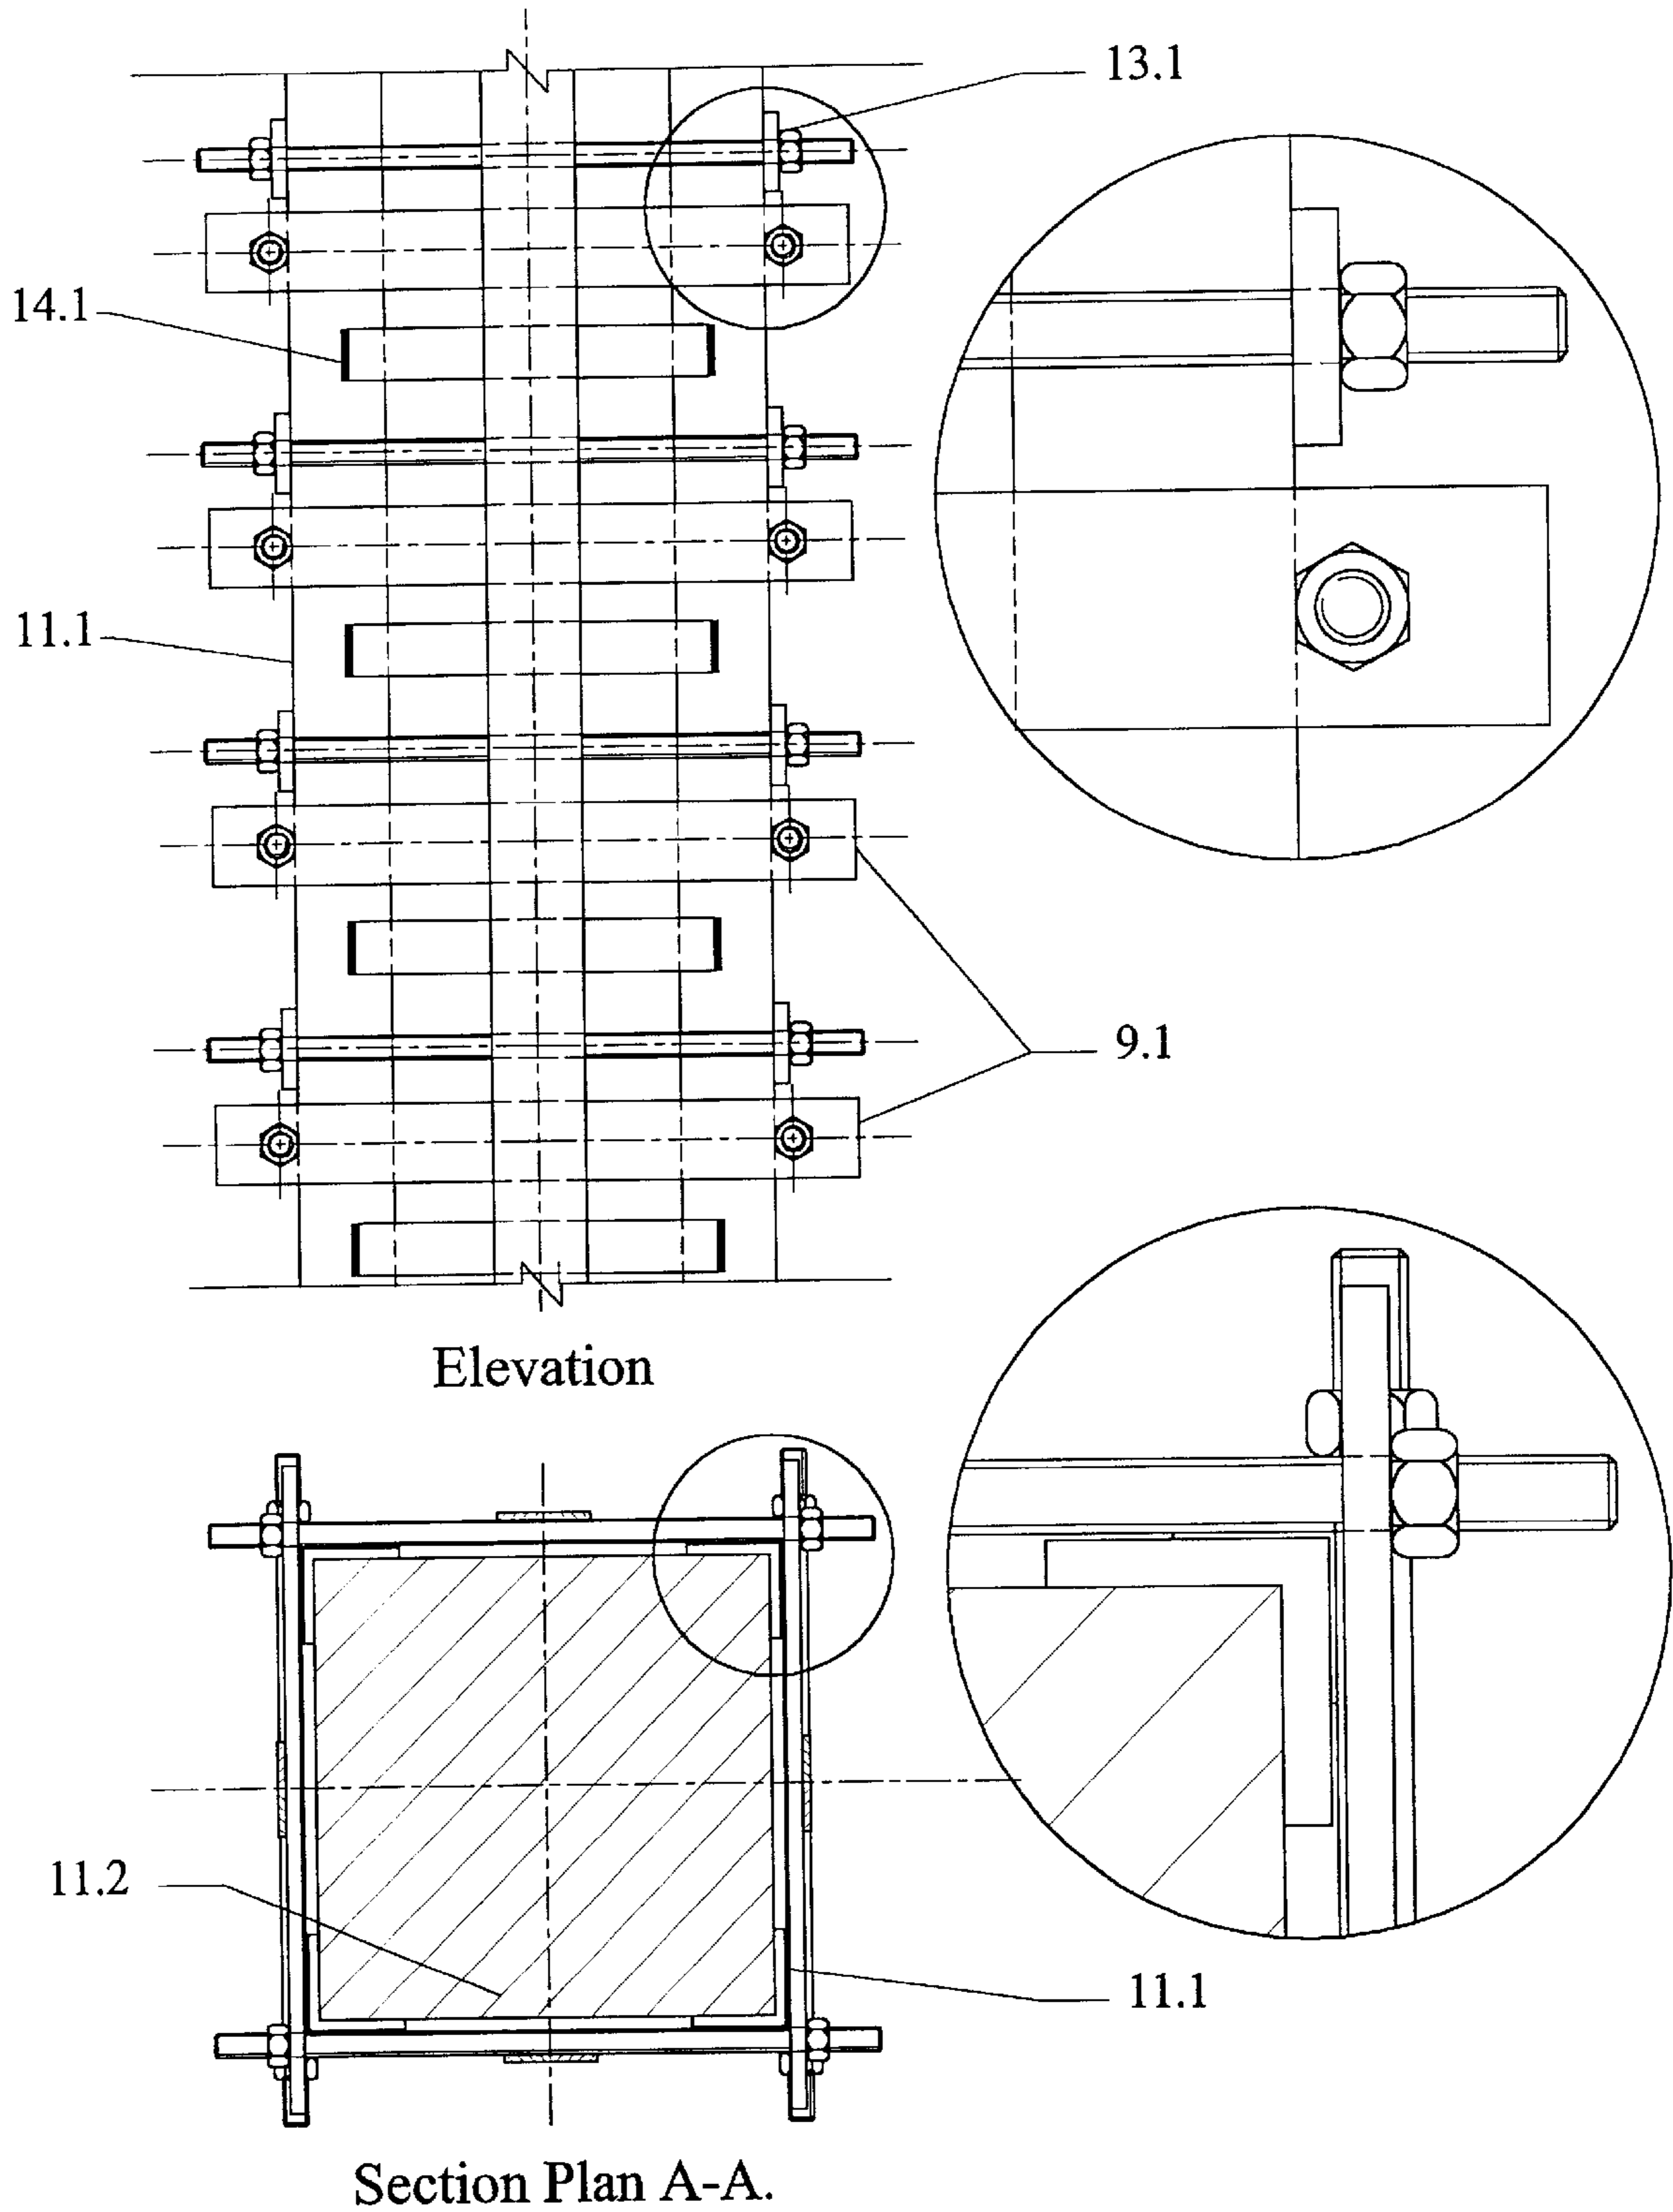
An Elevation and a Section of a Column After Applying Confining Pressure Uesing the Pressure Casing 2.
